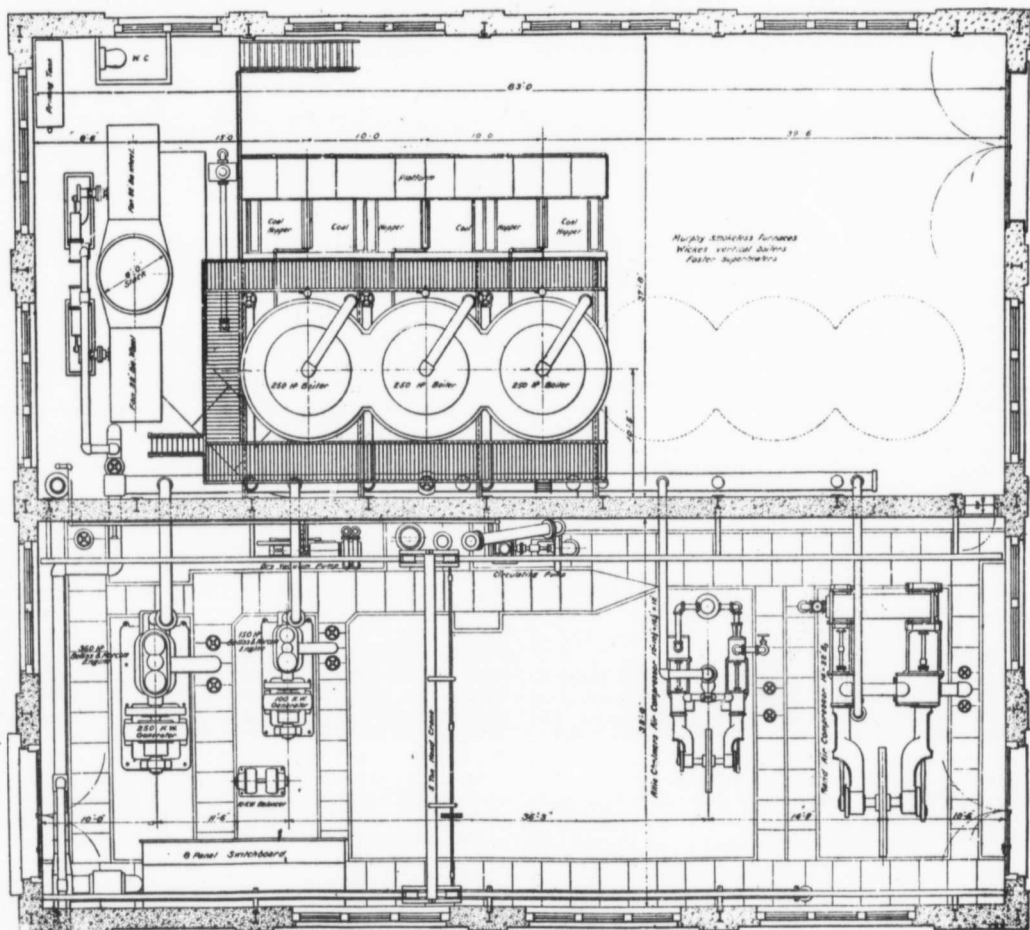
Plan of Power Plant, Canadian Locomotive Works, Kingston.
